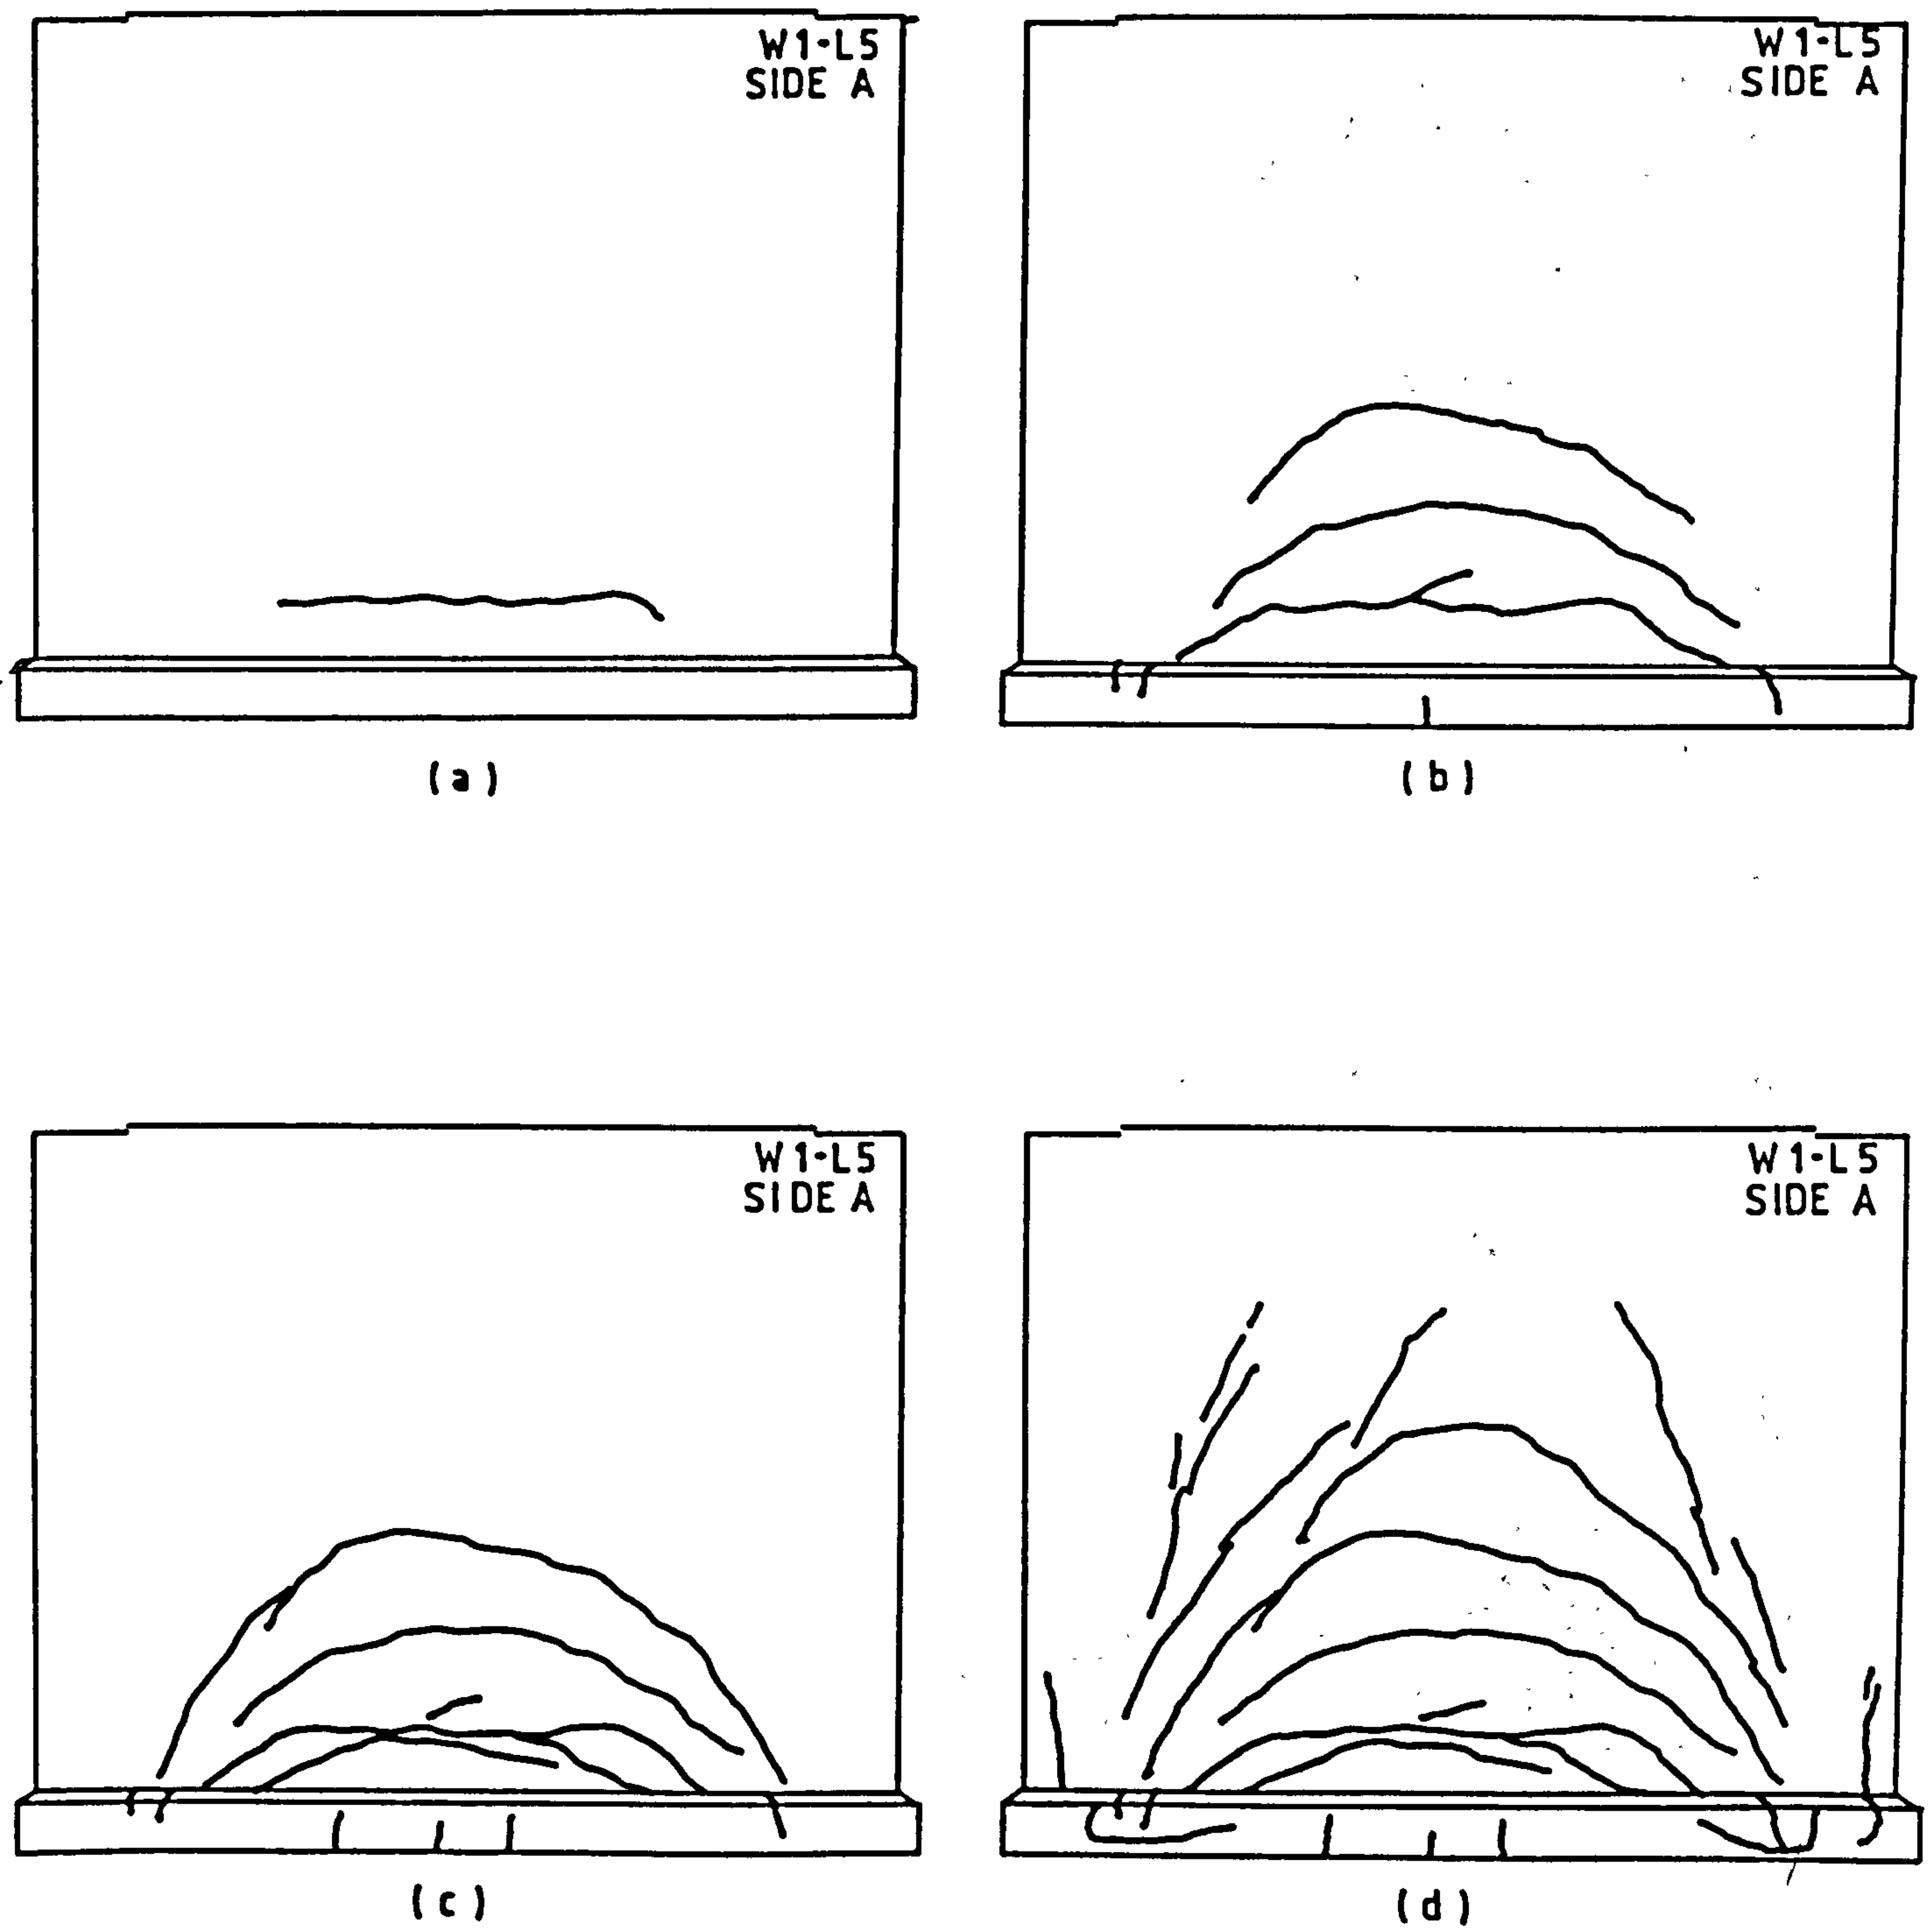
Development of cracks in wall W1-L5
